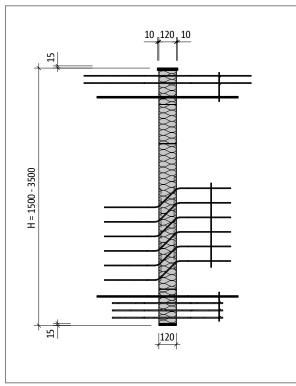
Schöck Isokorb® XT type W-M1: Product section
